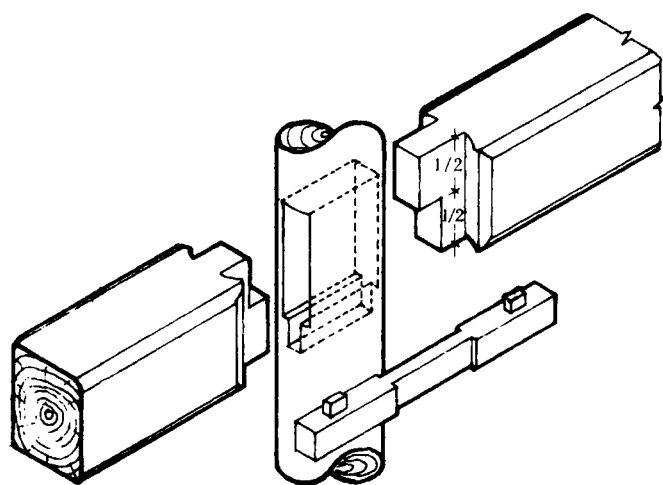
Tenon Joint Is Used to Connect Beams and Columns
